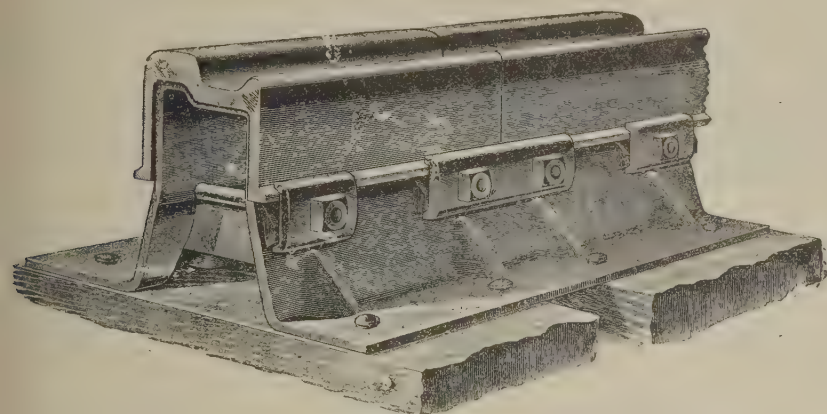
LONG JOINT CHAIR—BOX GIRDER RAIL.
